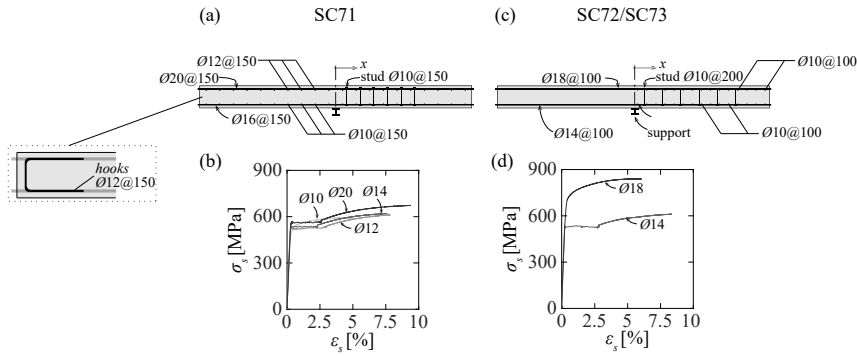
(a) reinforcement layout of specimens and (b) measured stress—strain relationships of reinforcement bars for slab SC71; (c) reinforcement layout of specimens and (d) measured stress—strain relationships of reinforcement bars for slabs SC72, SC73.
